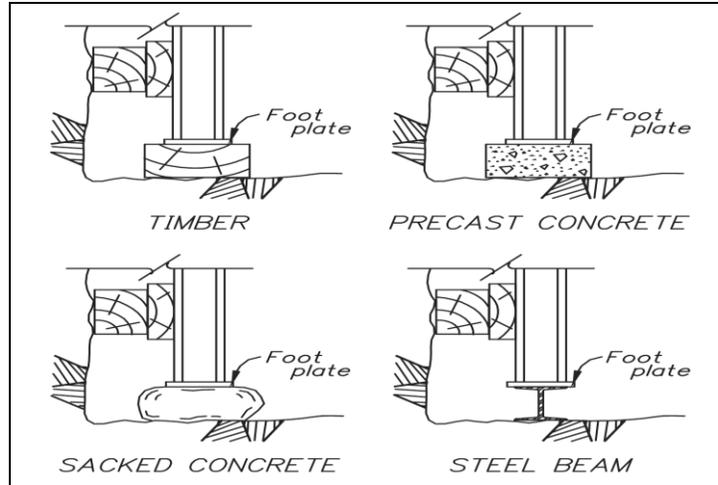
Typical foot blocks detail.
